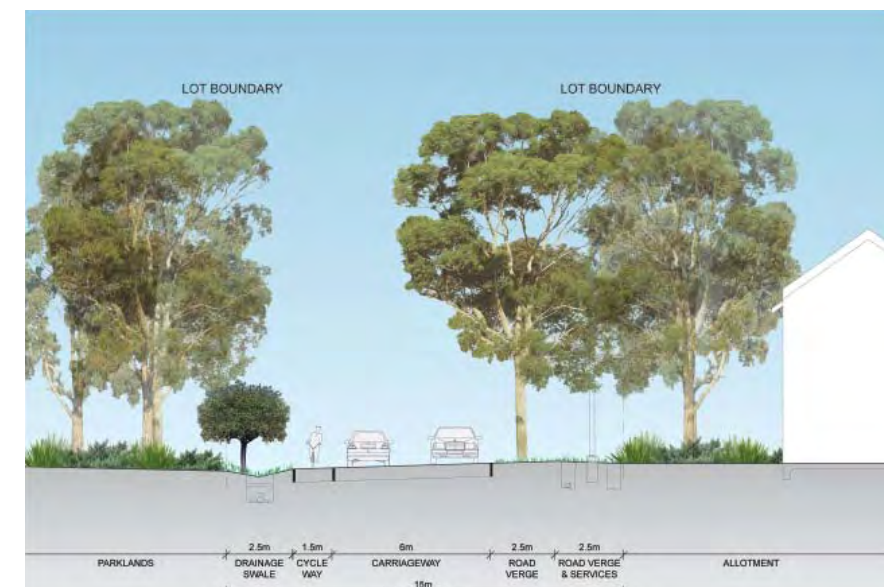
Section B-B through Hale Street with Cycleway.
